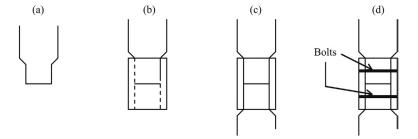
Splicing of timber piles. (a) Usually, timber piles are tapered prior to splicing as shown in Fig. 5.1. (b) The sleeve (or the pipe section) is inserted. (c) Bottom pile is inserted. (d) The pipe section is bolted to two piles.
